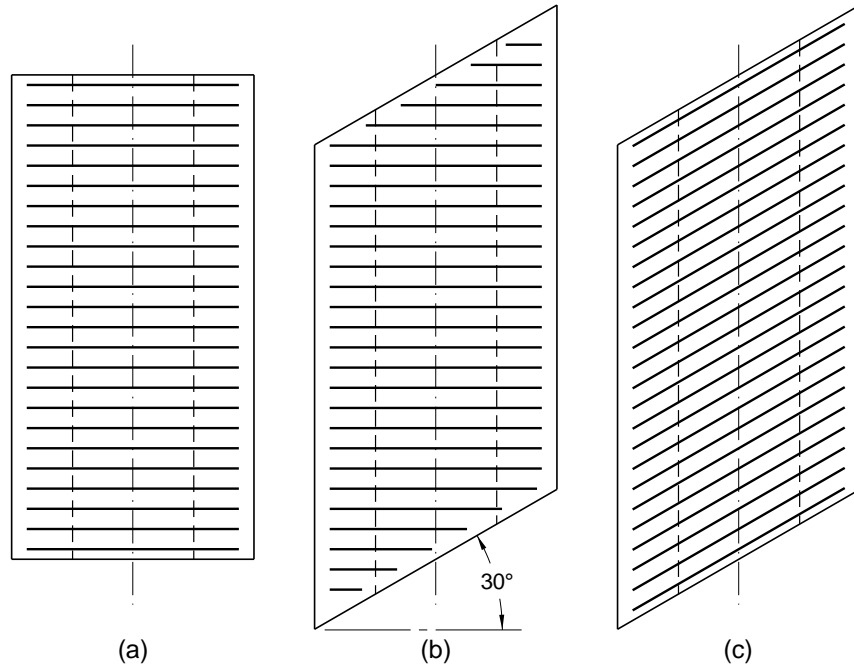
Options for Transverse Reinforcement in Skewed Inverted T-Beam Bridges:
